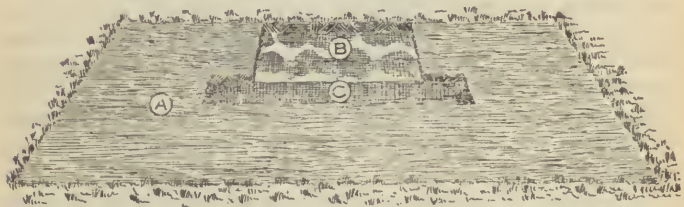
Method of flyproofing latrine pit with oiled burlap. A-Layer of earth replaced and tamped down over burlap. B-Oiled burlap exposed before replacement of earth. C-Opening of pit.
